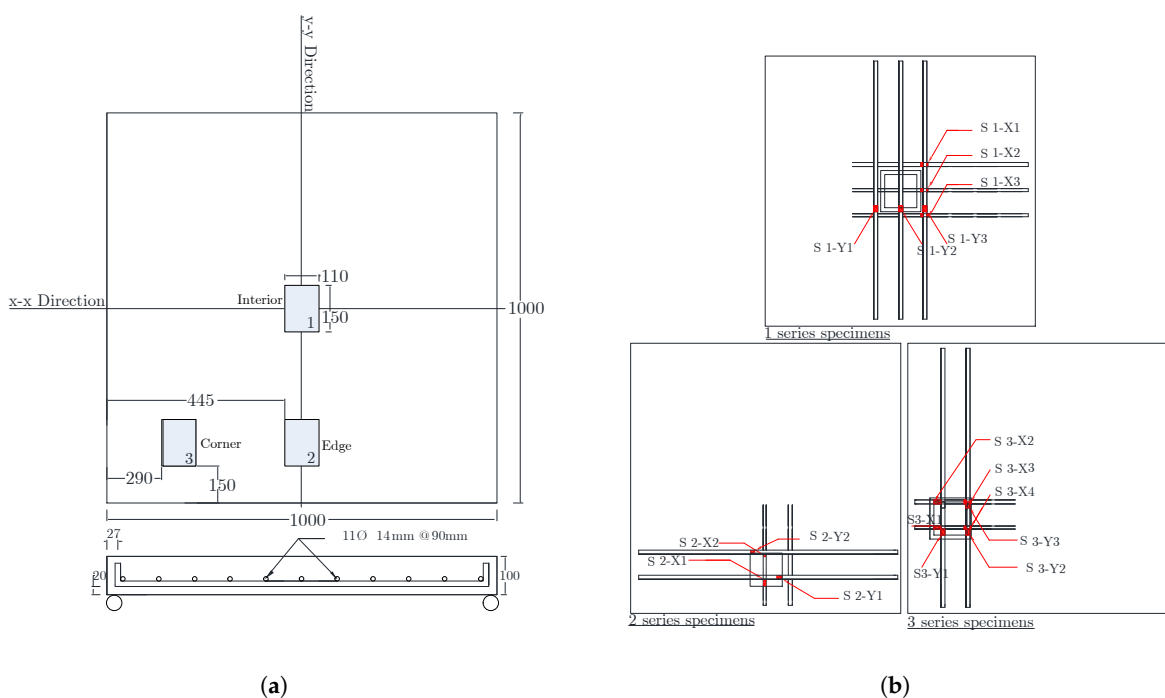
(a) Specimen geometry and rebar configuration, (b) location of loading zone and strain gauges.
